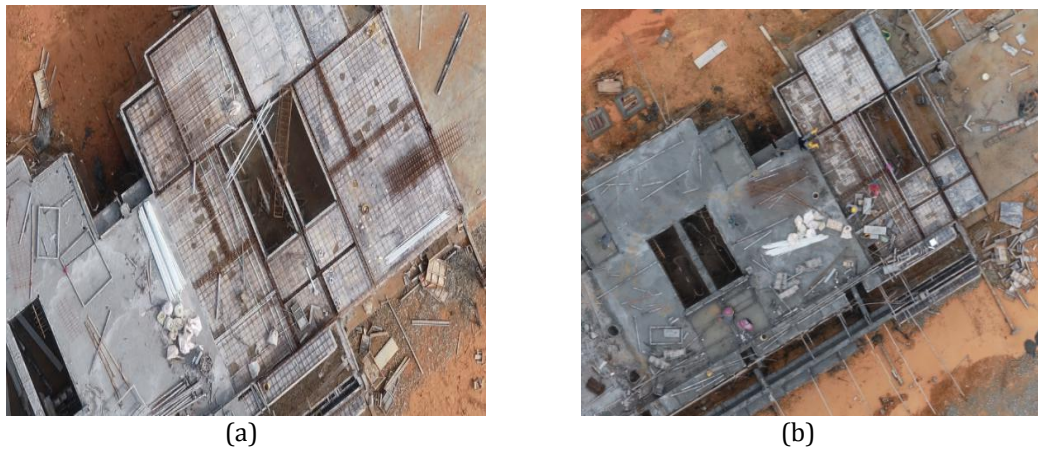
The image of (a) the third week for Block 4, shows 5 unit houses has complete their slab to level 2, 2 units houses have installed reinforcement for slab level 2, 8 unit houses still pending for slab level 2, and (b) in the fourth week, 7 unit houses have complete slab to level 2, 1 unit house has installed reinforcement for slab level 2 and 7 unit houses are still pending for slab level 2.
